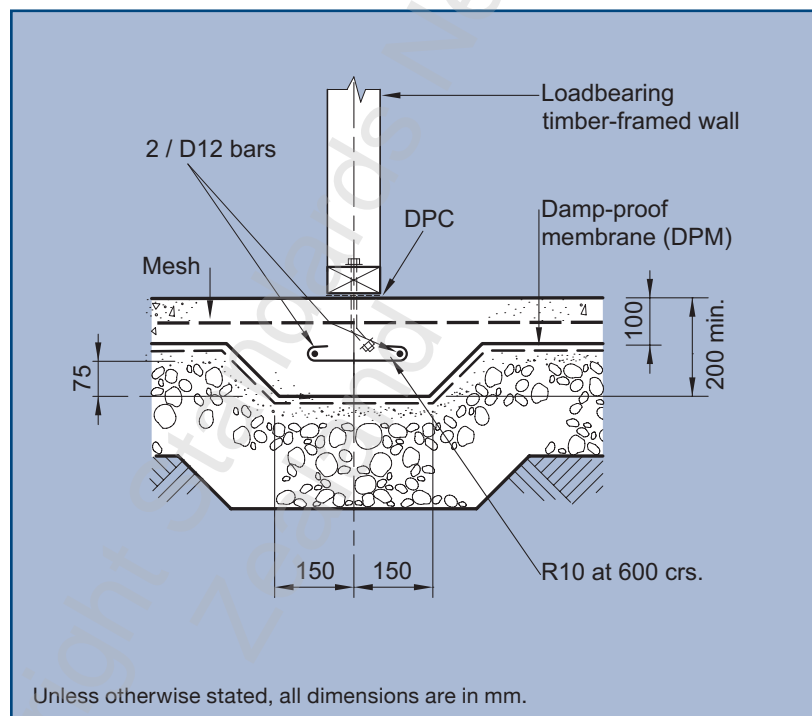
Ground slabs beneath internal loadbearing walls (see 7.5.11.2)
